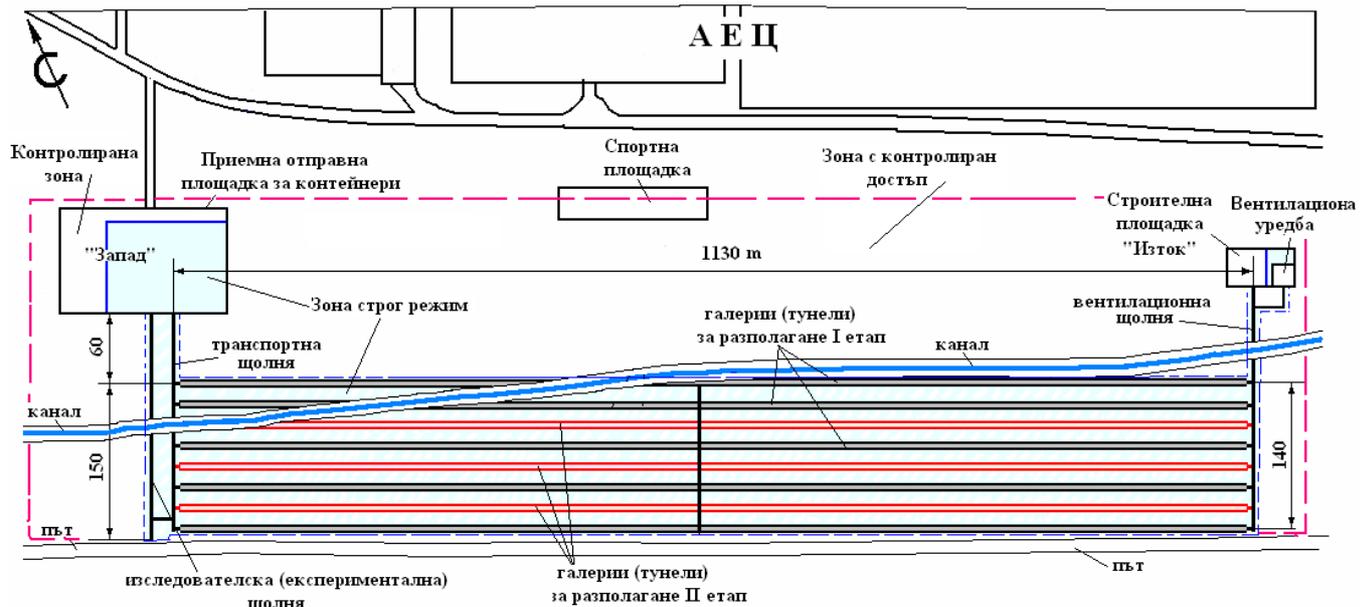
LAYOUT OF A TUNNEL TYPE REPOSITORY
